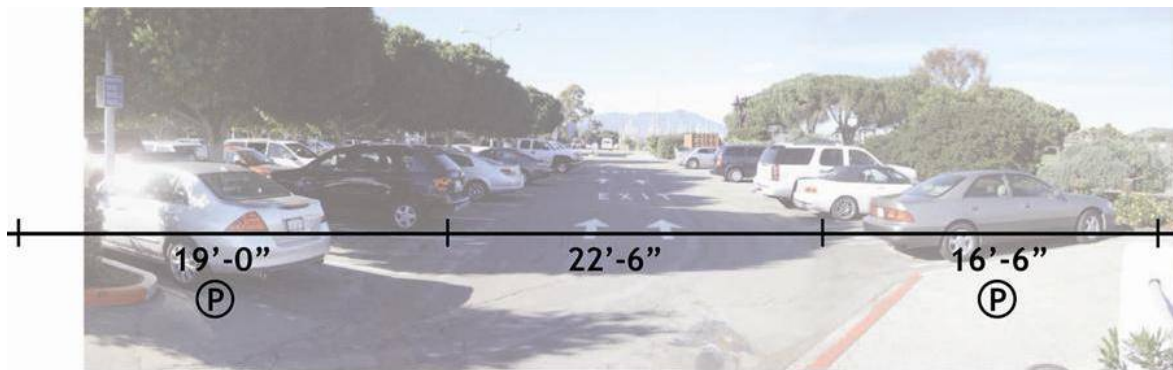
Segment 1B Parking Lot 1 Existing Condition
